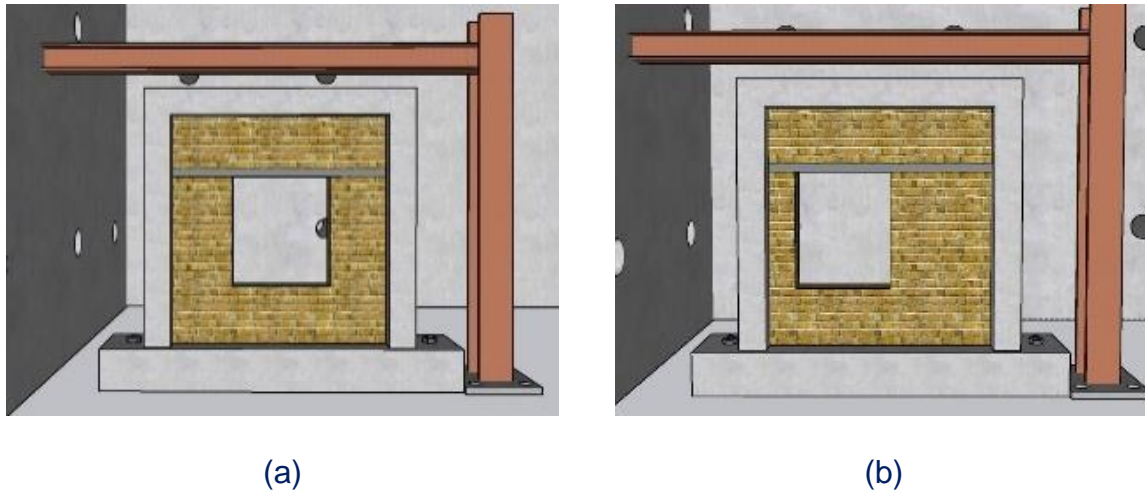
Configuration of the infilled frame. (a) Infilled frame with central window (CW) and (b) Infilled frame with eccentric window (EW)
